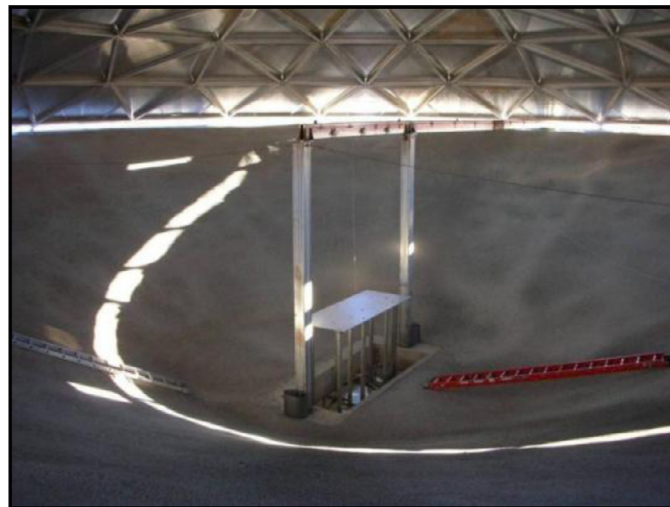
Lifting of plugs at drainage junction between reservoir and concrete pipes.
